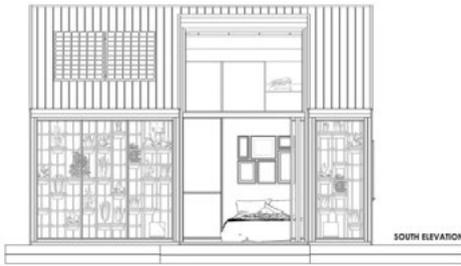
The house south façade showing the integrated design of the hybrid Trombe wall and the green wall as passive systems.
